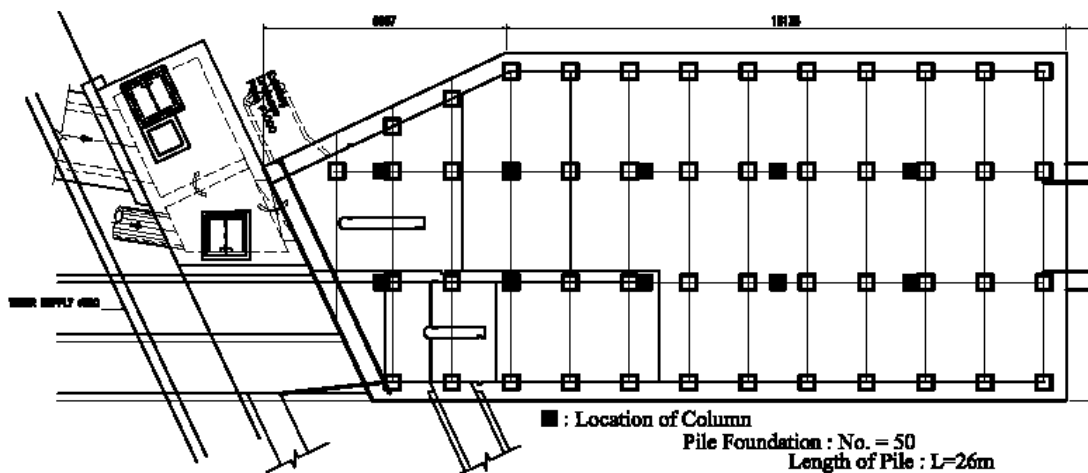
Plan of Foundation Pile Arrangement of New Sediment Chamber
